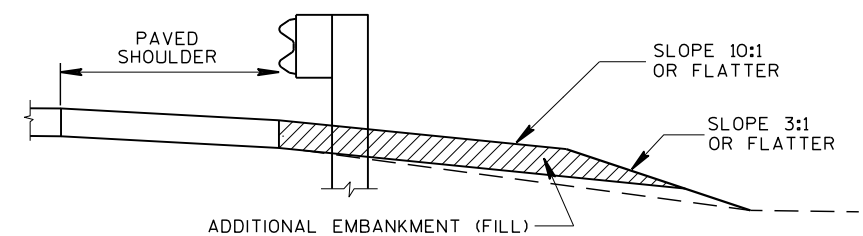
### DETAIL FOR SALVAGE AND REINSTALL GUARDRAIL ENERGY ABSORBING TERMINAL
